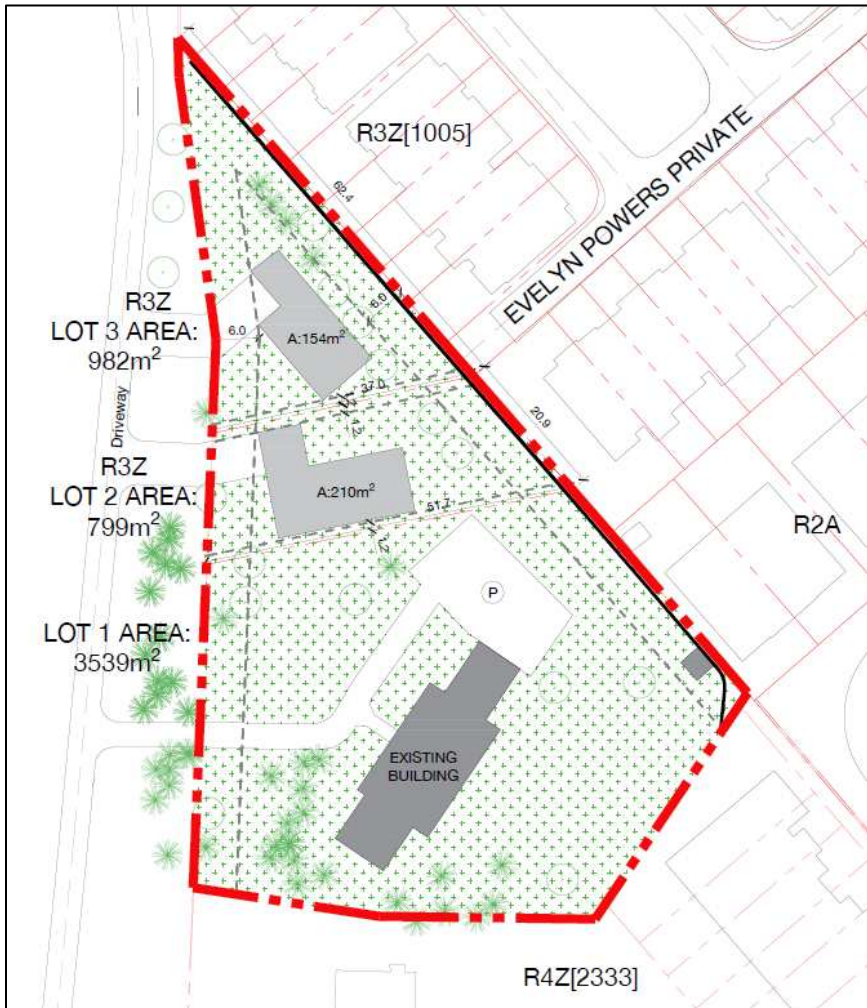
Concept Plan – P1 showing two (2) new detached dwellings
